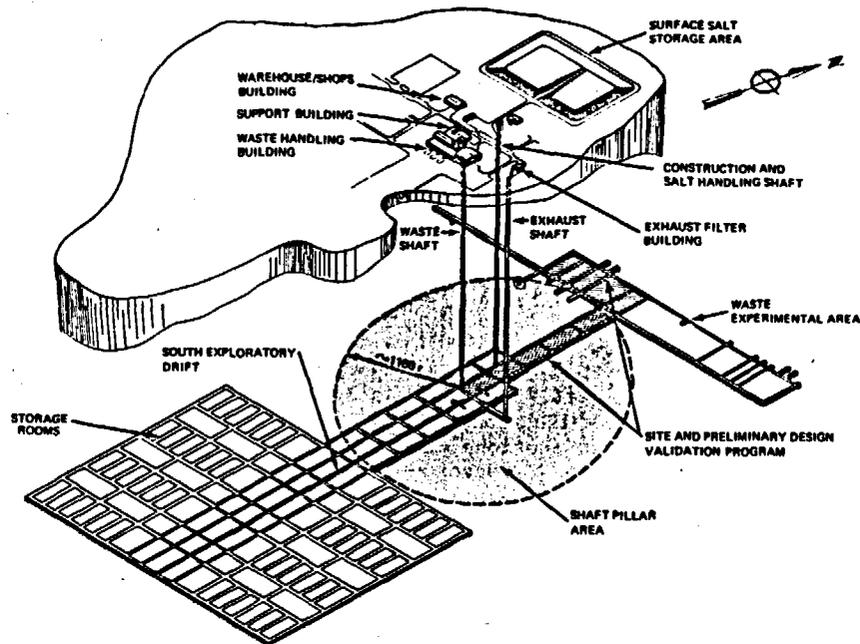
LAYOUT OF THE WASTE ISOLATION PILOT PLANT. THE CROSS-HATCHED AREA SHOWS THE DRIFTS AND ROOMS EXCAVATED UNDER THE SPDV PROGRAM.
